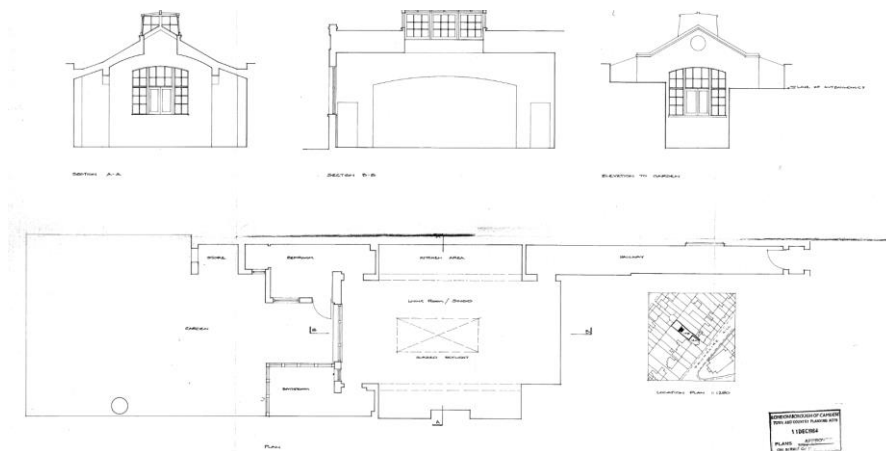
14A Downshire Hill, Ground floor front room. Source: London Picture Archive
